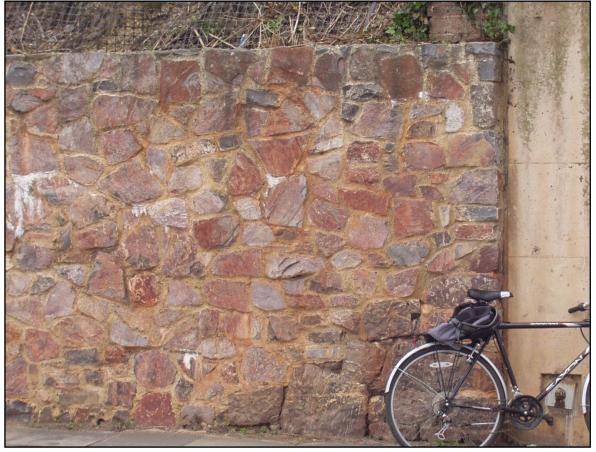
Cowley Bridge Road, Exeter. Blocks are laid with bedding parallel to the surface of the wall.
